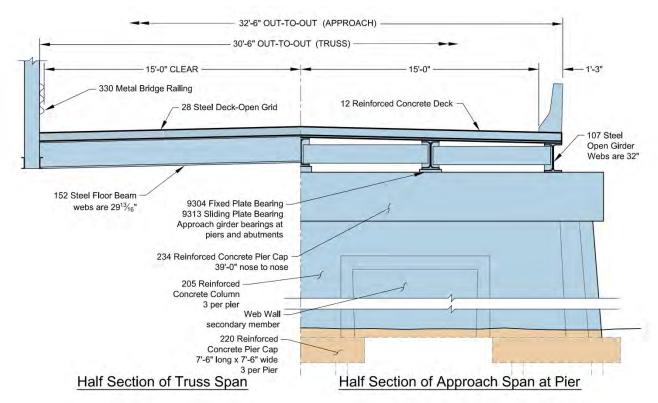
EI.24.10- 3: Cross section view of superstructure of steel truss bridge
